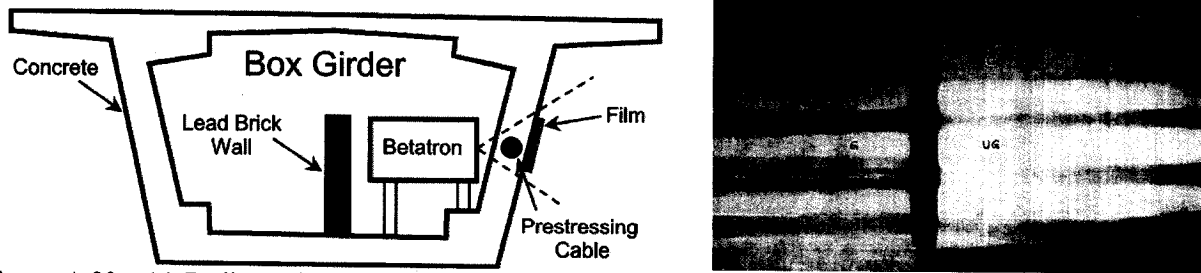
(a) Radiography setup for concrete box girder of bridge with (b) grouted (G) and ungrouted (UG) images for prestressed concrete (extracted from [206]).
